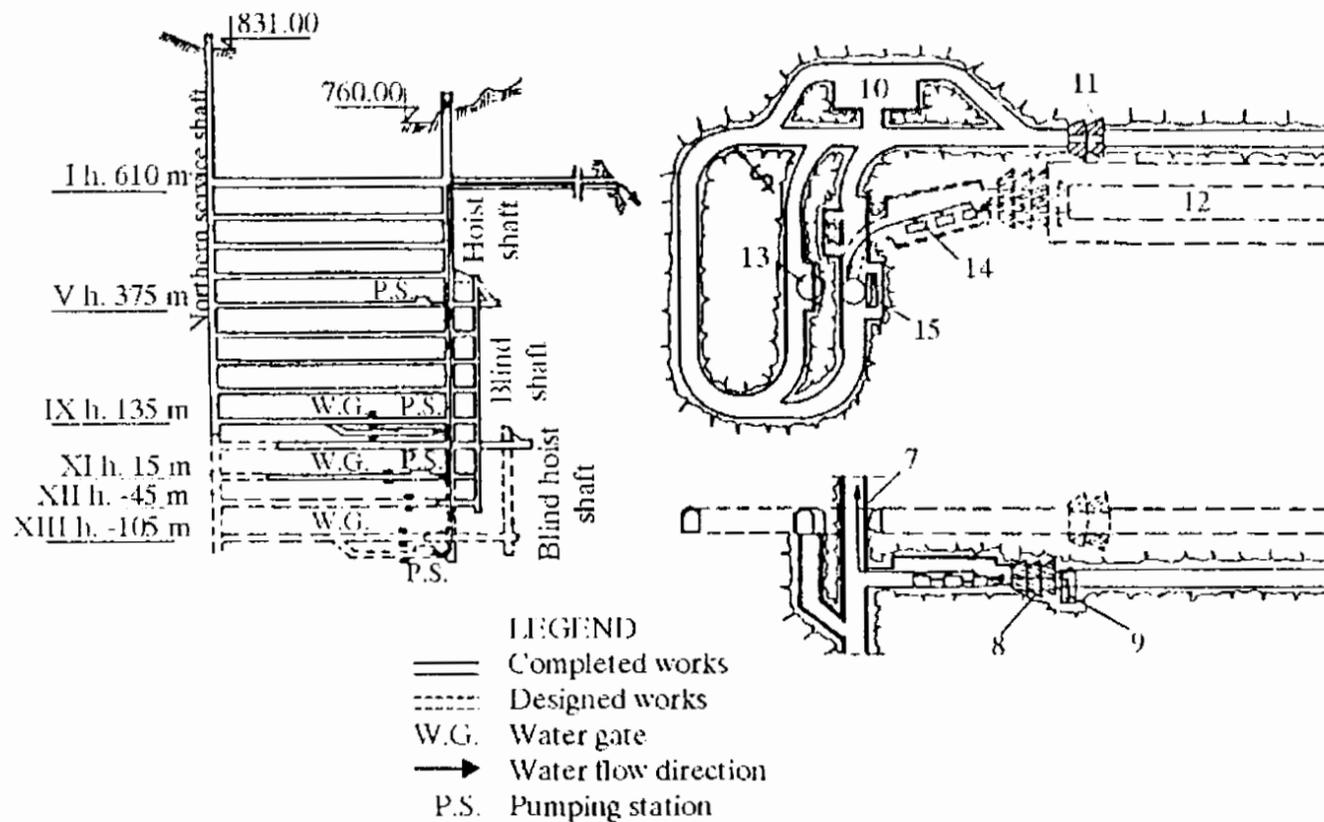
Mine drainage flow-sheet upon opening of the 13th horizon with drainage facilities layout on the 13th horizon
